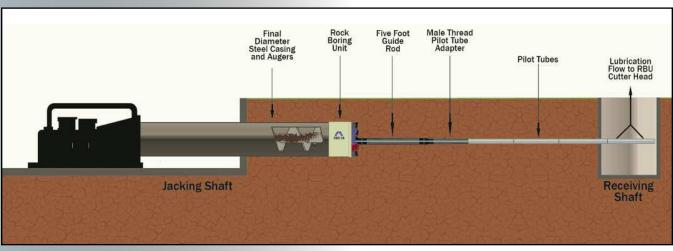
The Rock Boring Unit excavates up to 42-inch diameters in rock.
